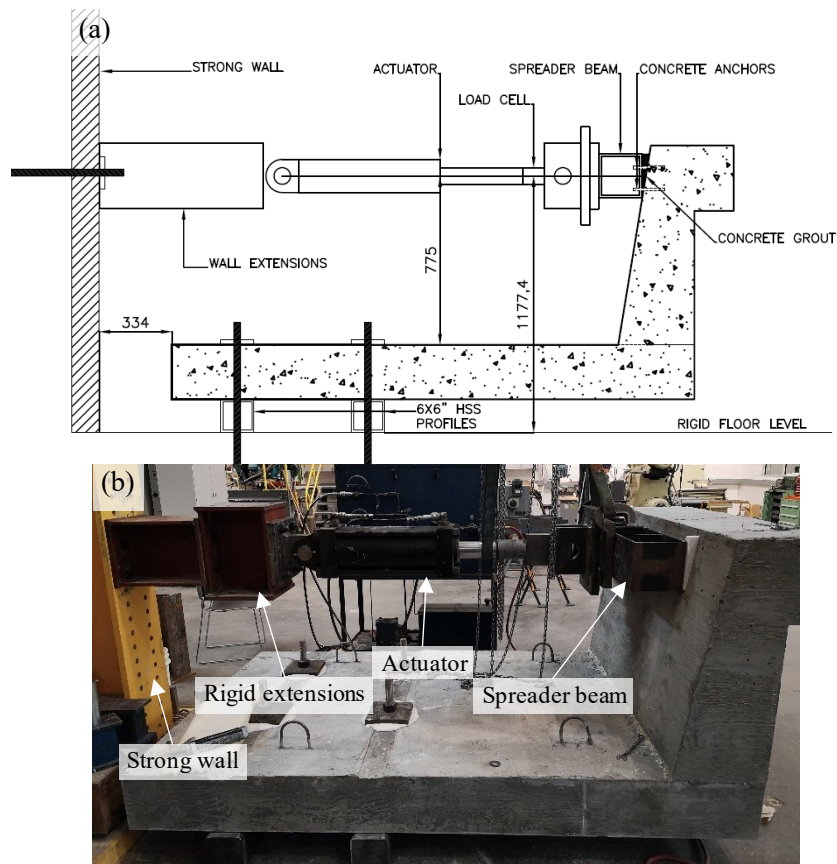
Test setup (a) drawing and (b) photo. All dimensions in mm.
